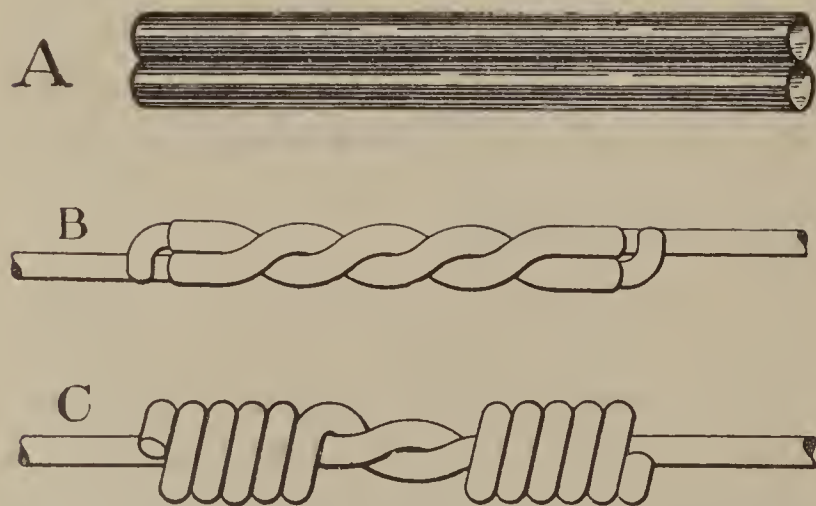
Method of joining wire. A—McIntire sleeve before using; B—McIntire sleeve after using; C—Standard Western Union joint.
